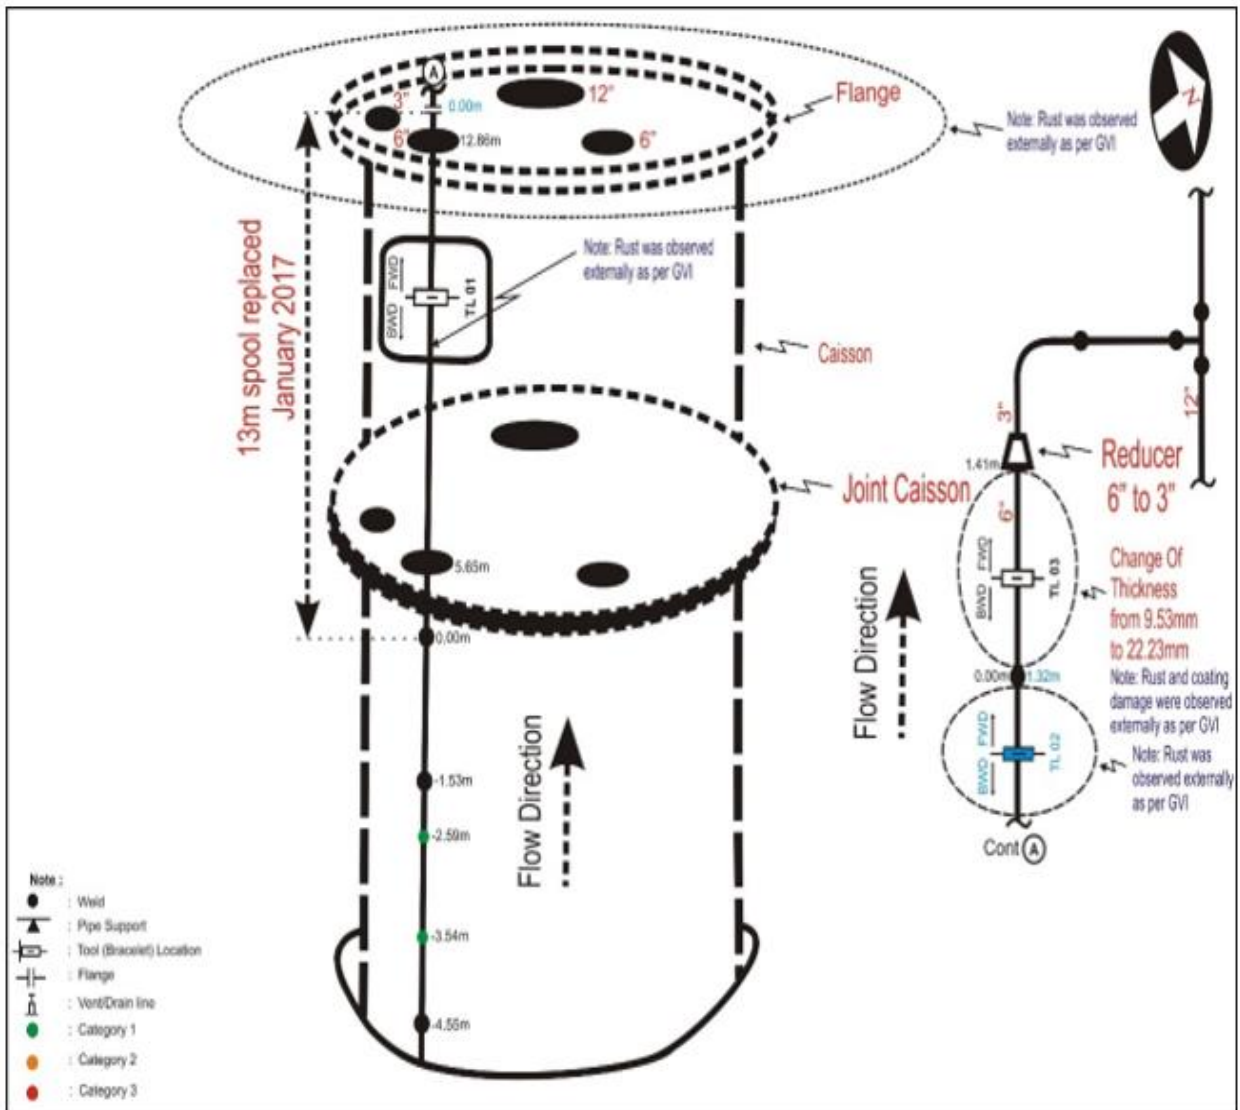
6 inches gas lift riser (Long range ultrasonic testing inspection)
